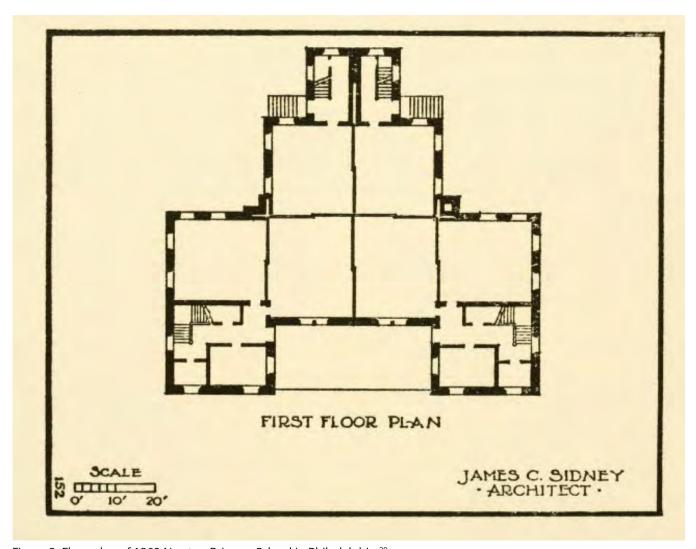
Floor plan of 1869 Newton Primary School in Philadelphia.²⁹
